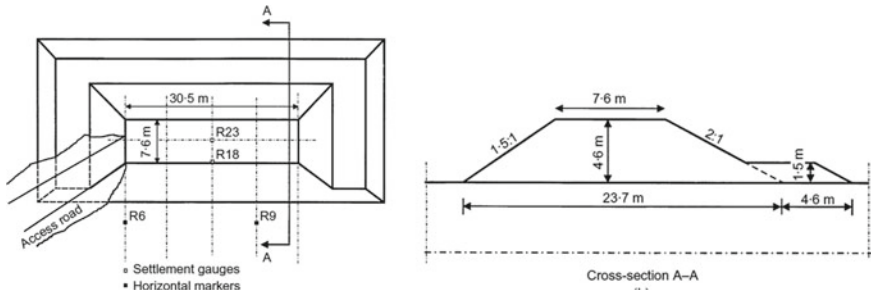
Plan view and cross section of Saint Alban test embankment Ref. [4]
